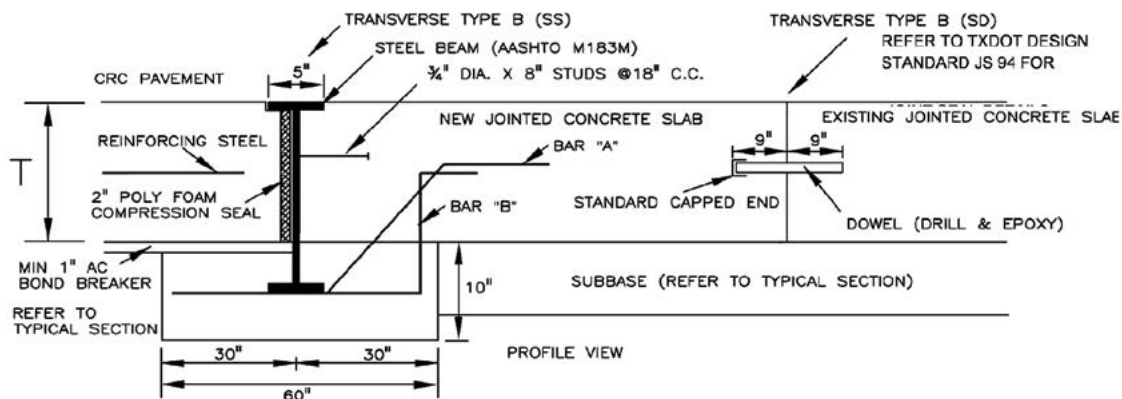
Transition from CRCP using a sleeper slab and a wide-flange I-beam.
